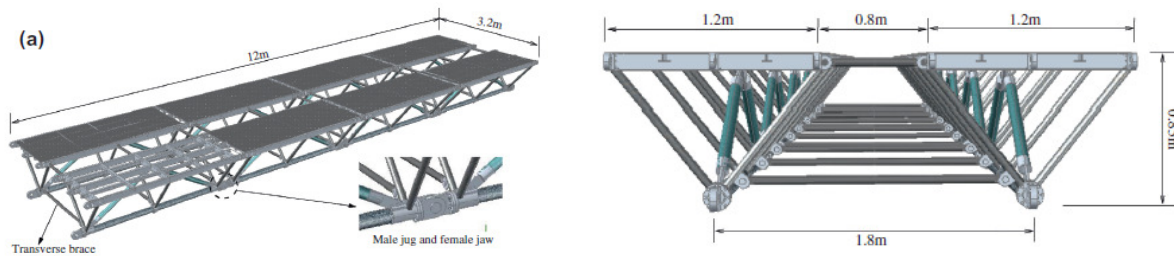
Hybrid FRP-aluminum space truss bridge design concept:
